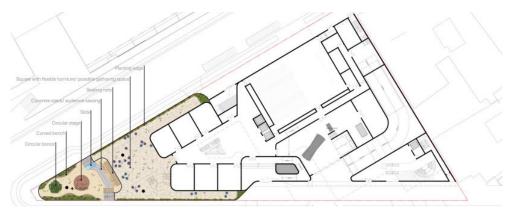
Ground Level Landscape PlanSource: Turf Design Studio
